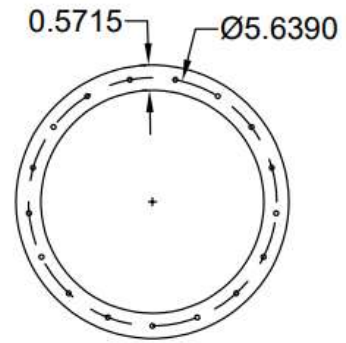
200 m cross section at 150 m, 17 ducts.
